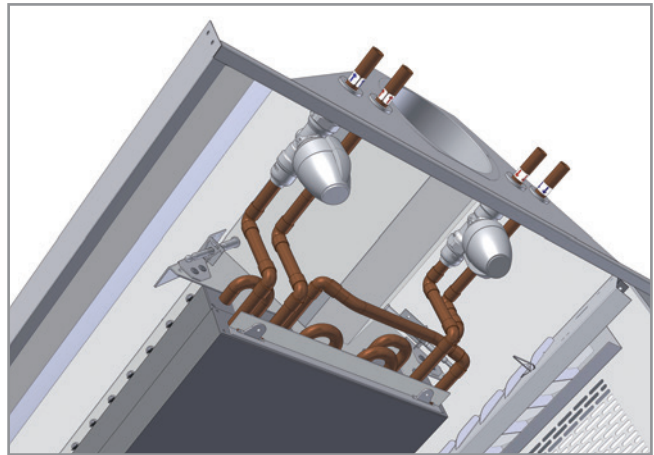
Illustration of how the valve and actuator is placed inside the chilled beam, A1 example, Premax.
